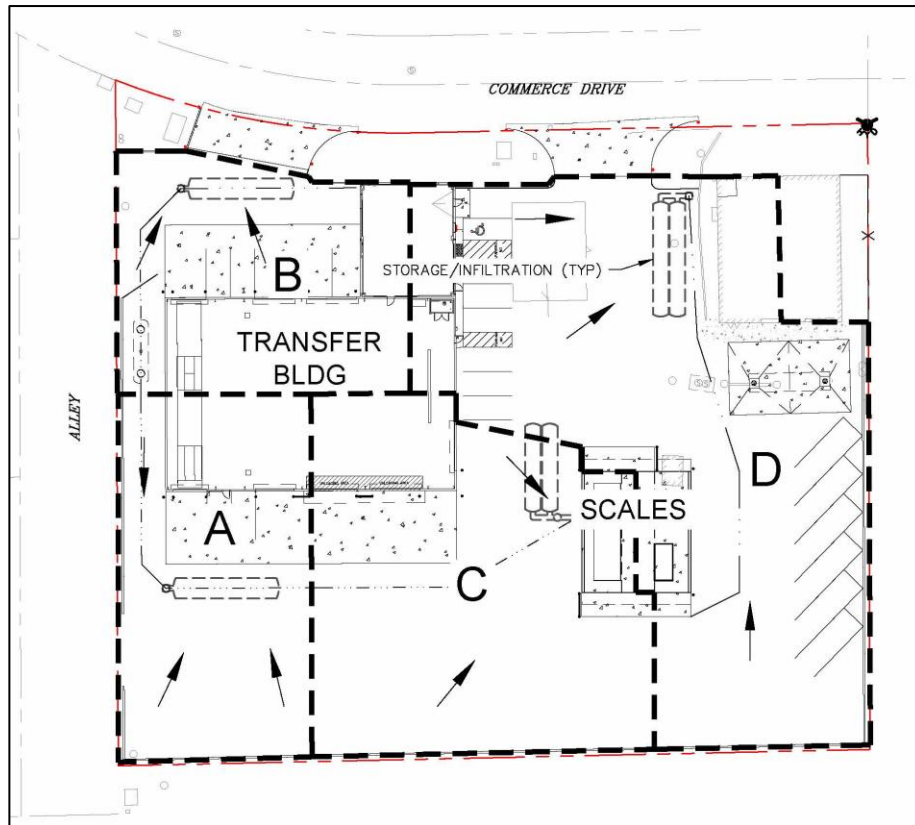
Figure A indicates overall contributing drainage sheds for the developed conditions at the 59 Commerce Drive site. Stormwater storage and infiltration systems are conceptually shown. The site does not receive run-on from adjacent parcels. Peak flows are shown on the following tables, including Table 1 for existing (pre-project) conditions, and Table 2 for developed conditions.
